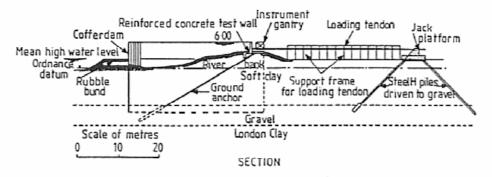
General arrangement of the test facility (from Hanna, 1982)
